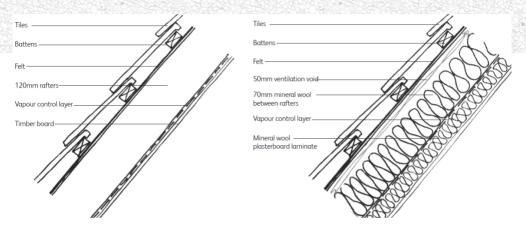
Preliminary sketch sections through existing & proposed roof build up
